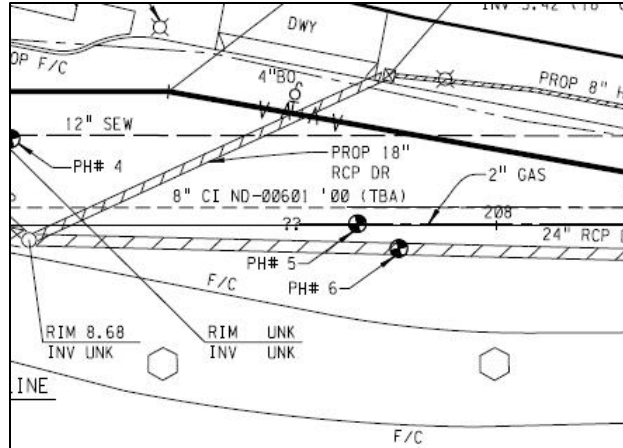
Potholes on Plan View (PH#5 and PH #6)
